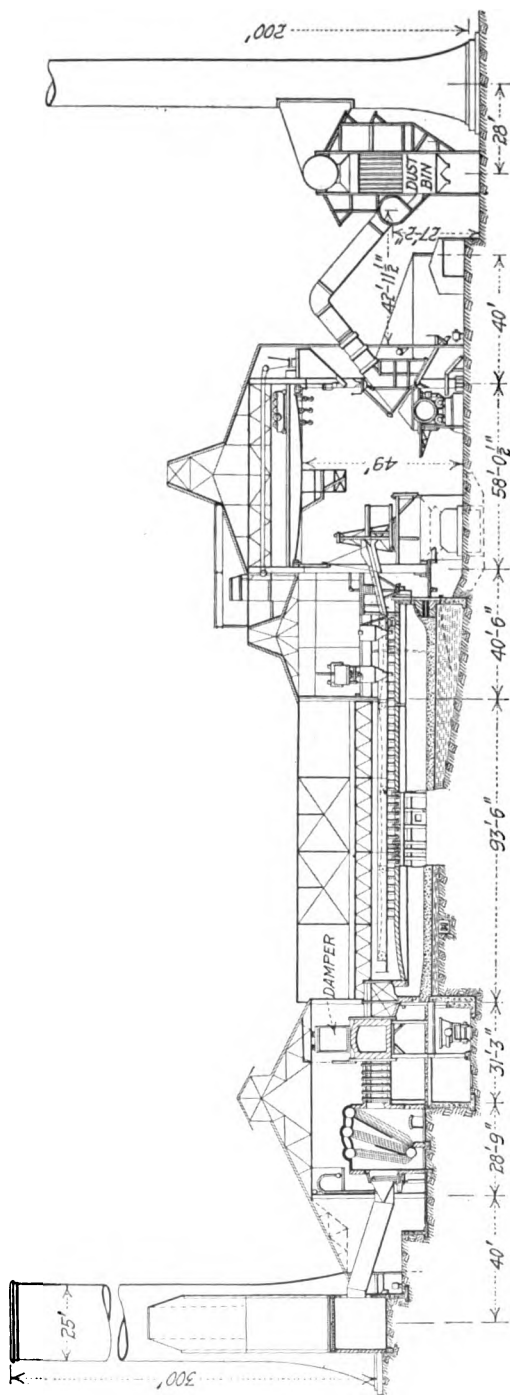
TYPICAL CROSS-SECTION OF THE INTERNATIONAL SMELTING CO.'S PLANT.
